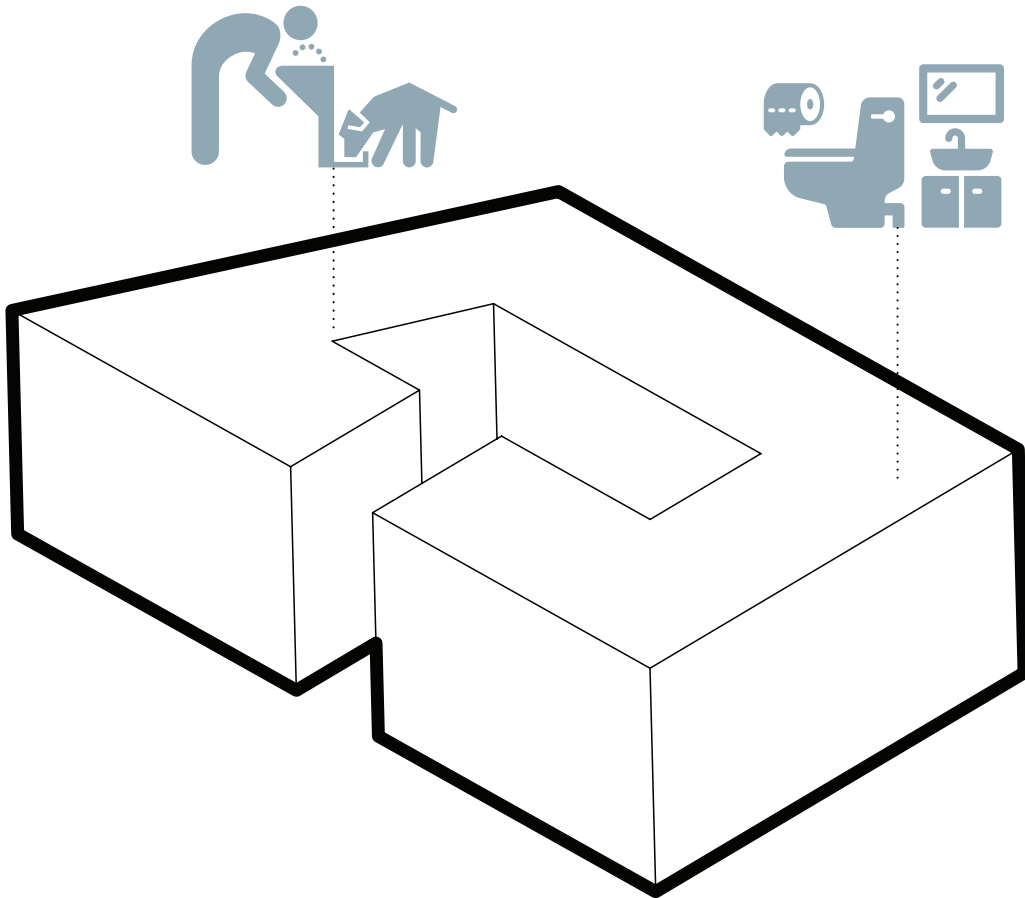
Core City Master Plan Framework Element Shelter
